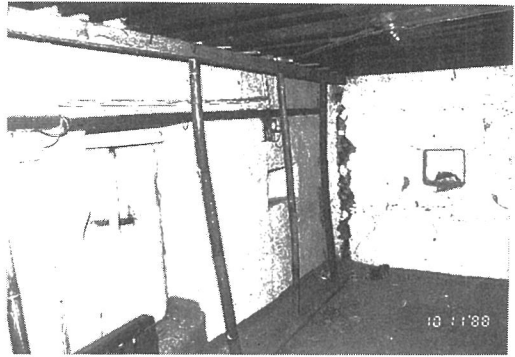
Interior view of the same damaged rural brick masonry house, Dhankuta Bazaar, Nepal
